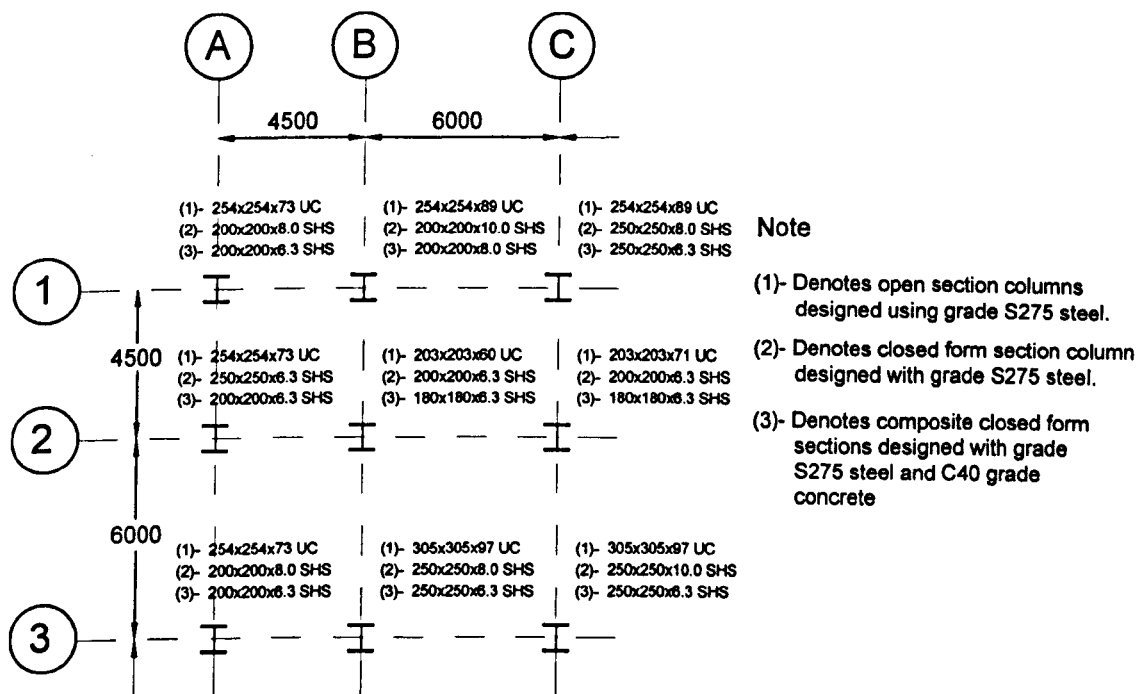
Column member sizes for UNBRACED construction in both directions
